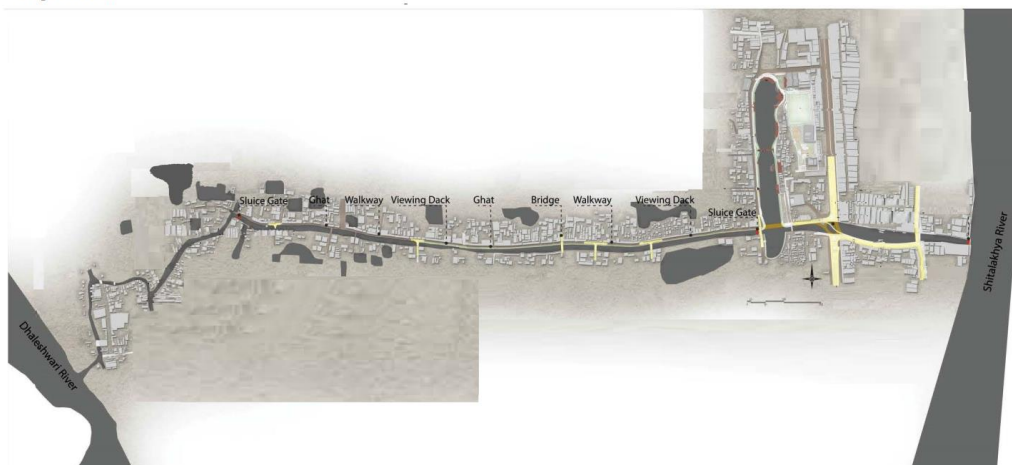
Layout Plan of Baburail Canal Re-excavation and other interventions
